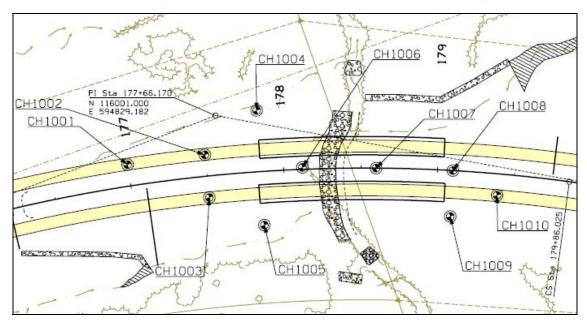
Boring layout for slope 15 (CH2MHill 2005)
